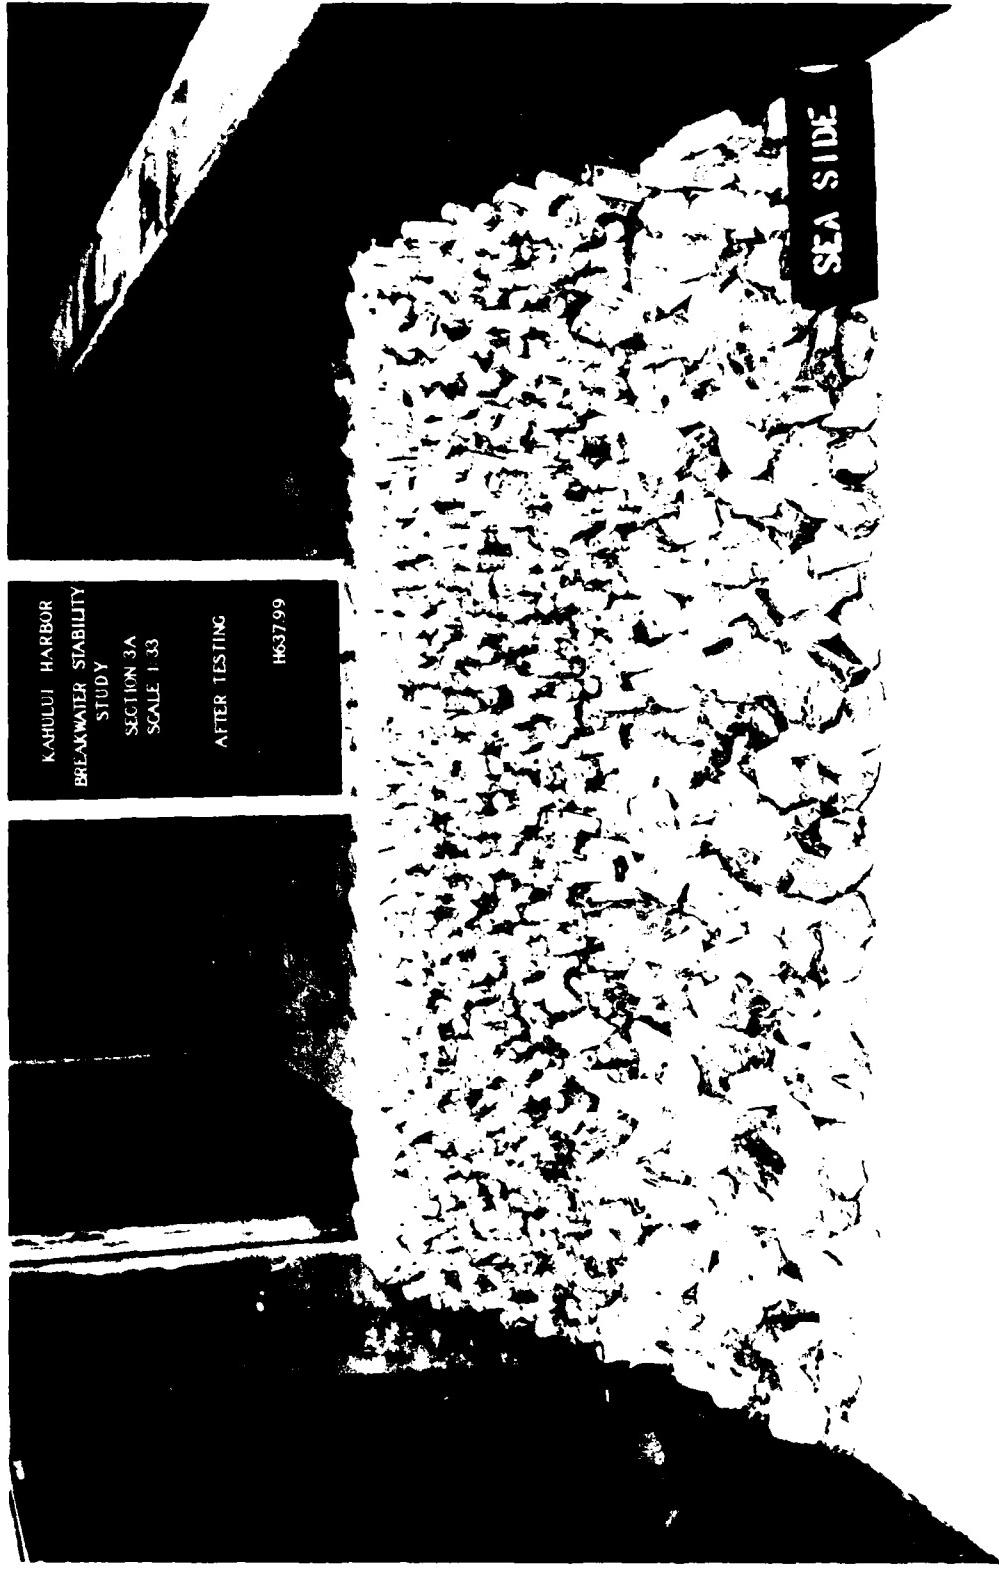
Sea-side view of Plan 3A after testing, 1st test
